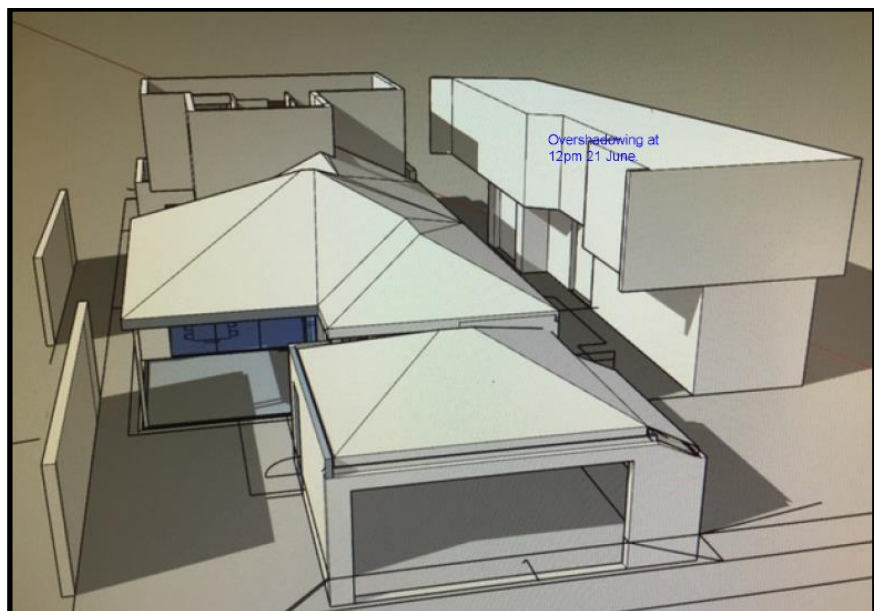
‘Overshadowing Plan 1’ 3D Image
